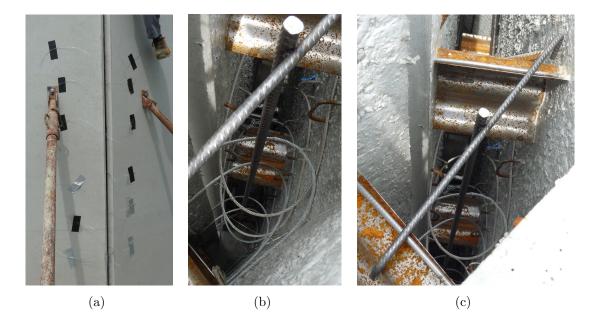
Steel cable loops as joint reinforcement where (a) wires fixed at the outside were used to pull the (b) loops into their final position (c) secured with a reinforcement bar hooked to two Kappema waves
